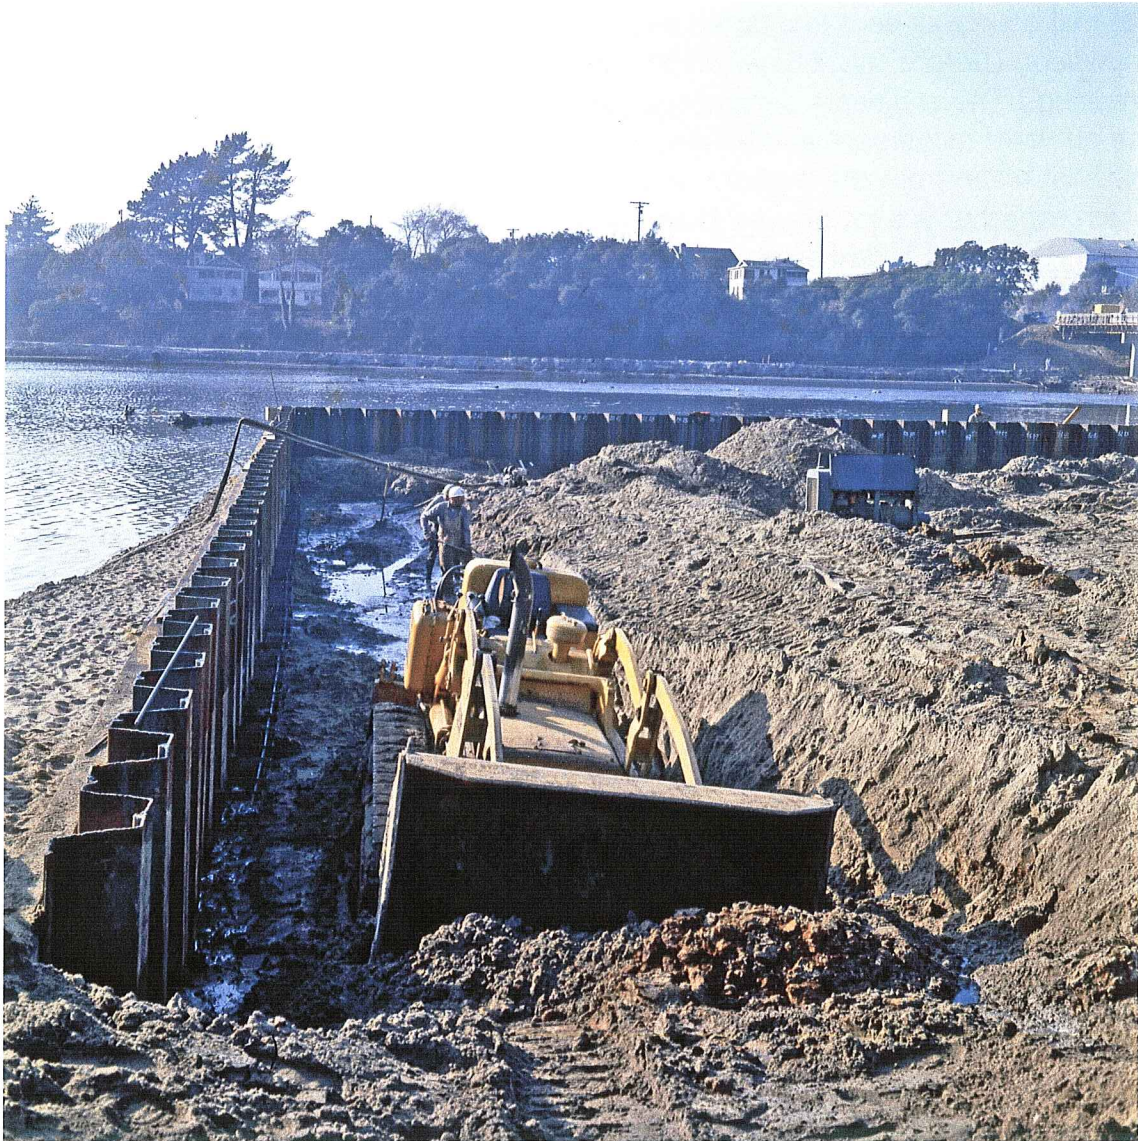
Sheet Pile bulkhead for the Boat Repair Dock. Excavating for tiebacks.
